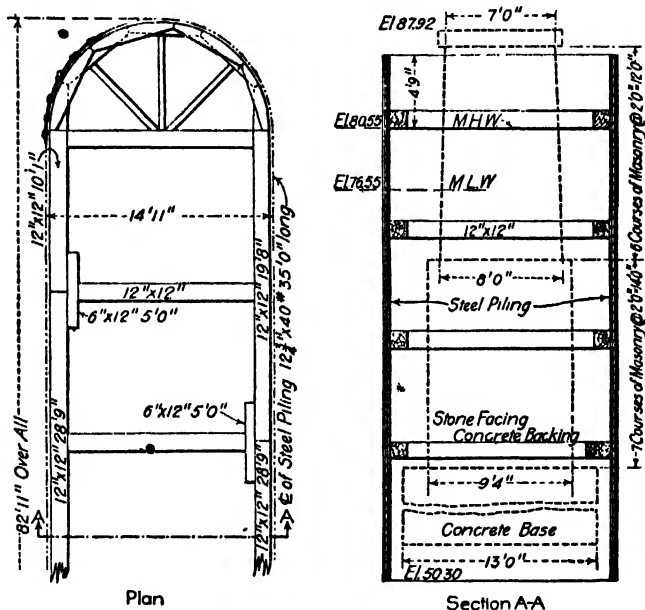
Cofferdam for Highway Bridge Piers in Passaic River, at Bridge Street, Newark, N. J.
